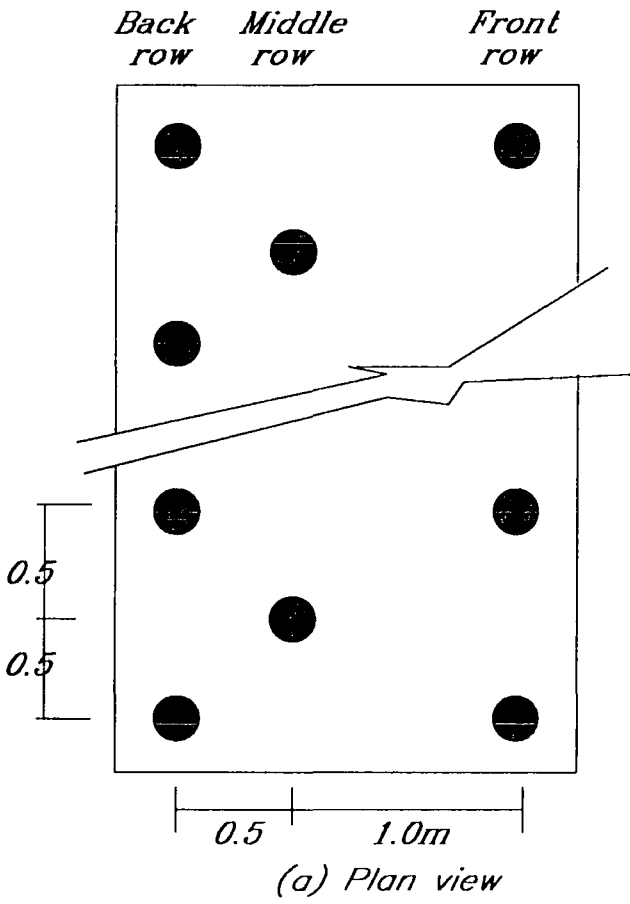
Pile group plan layout (after Matlock et al 1980).
